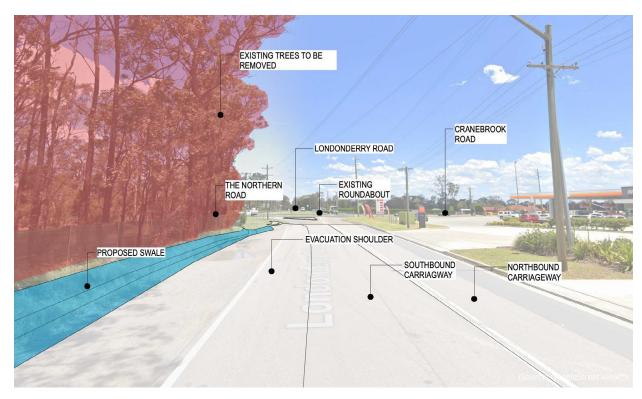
Viewpoint 4 - Intersection of Londonderry Road with The Northern Road and Cranebrook Road (facing south west - Proposal view
